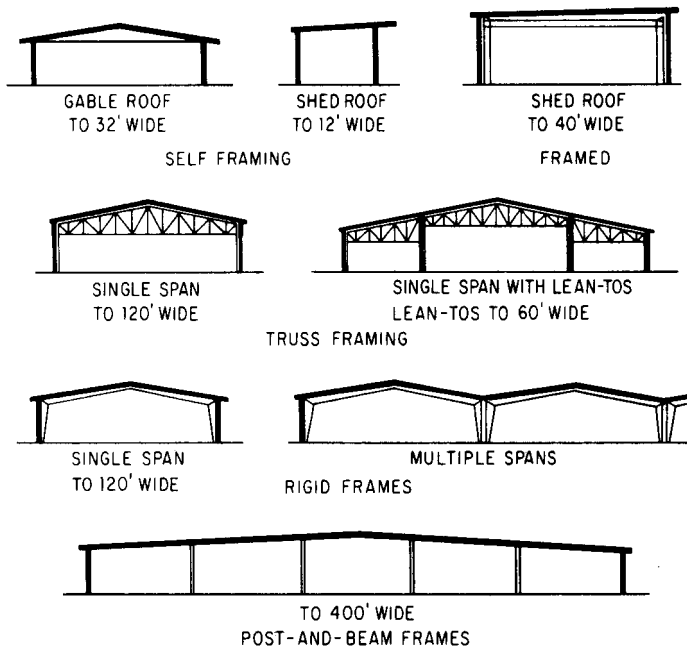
Principal framing systems for preengineered steel buildings.
